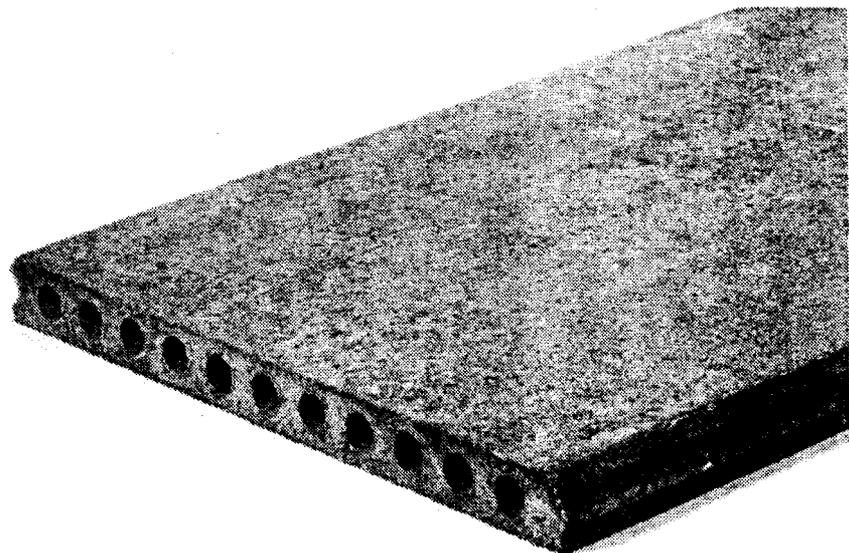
Ecopanelboard manufactured using an extrusion process.
